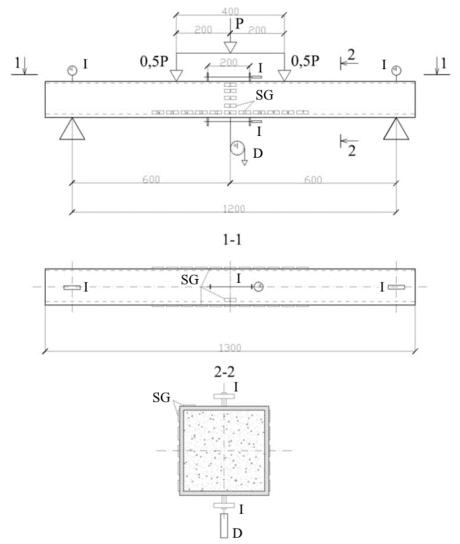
General view of the bending element and layout of measuring instruments: D - deflectometer; I - clock type indicators; SG - strain gauges
